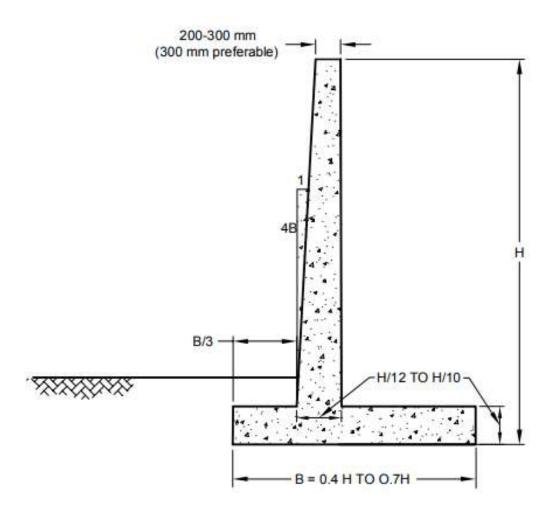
GEOMETRY OF RCC CANTILEVER RETAINING WALL
